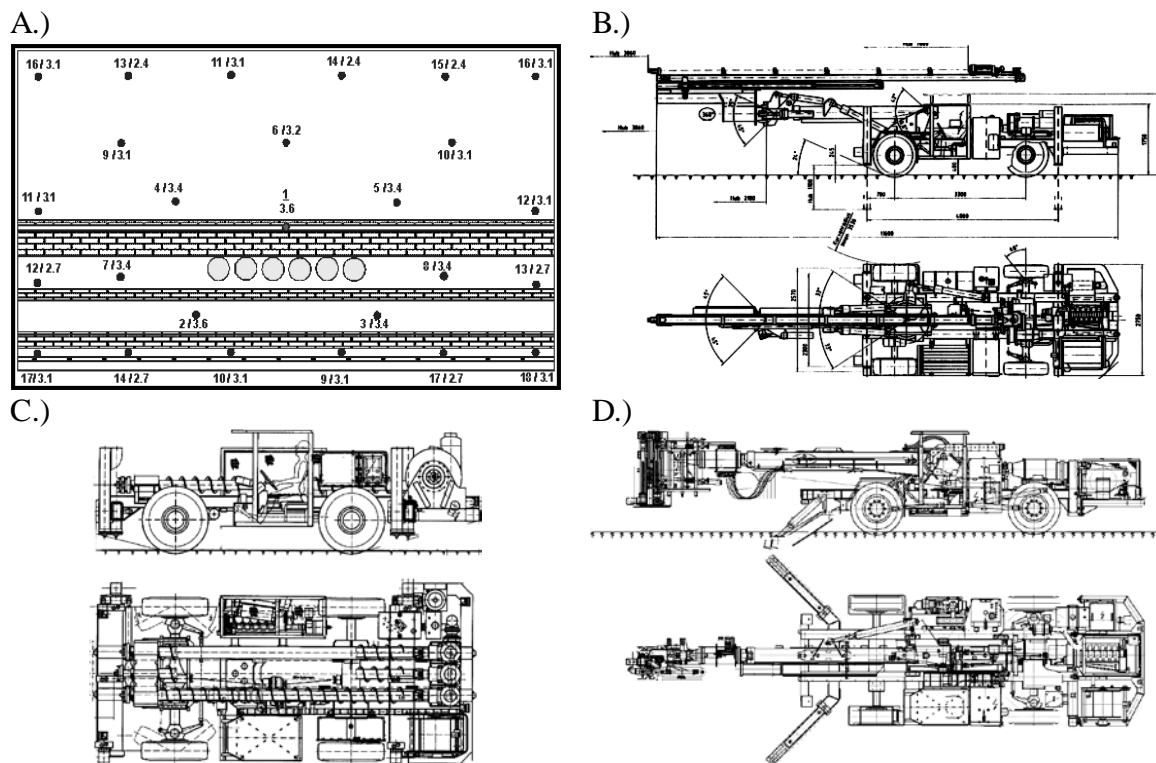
New blasting pattern (A.); Franz Schell GmbH face drilling machine DHB-41-E-ZF (B.); SMAG undercutting machine GB 280 (C.); SMAG roof bolter FA523V (D.)
